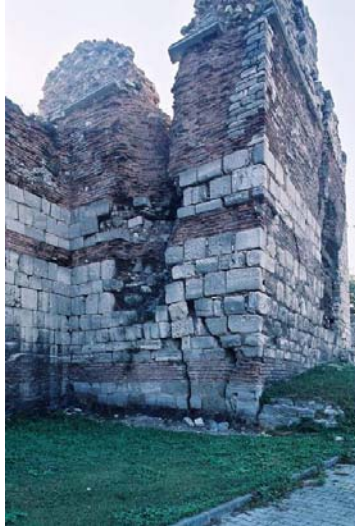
& 6: Istanbul City walls showing brick banding in surviving historic section and collapsed reconstructed section with fake banding.
